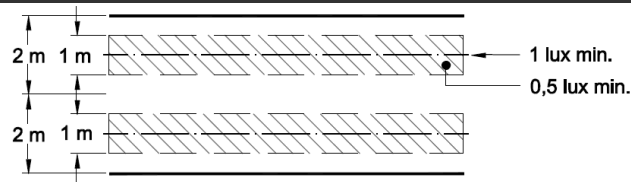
4 m wide defined escape route treated as two 2 m wide strips
